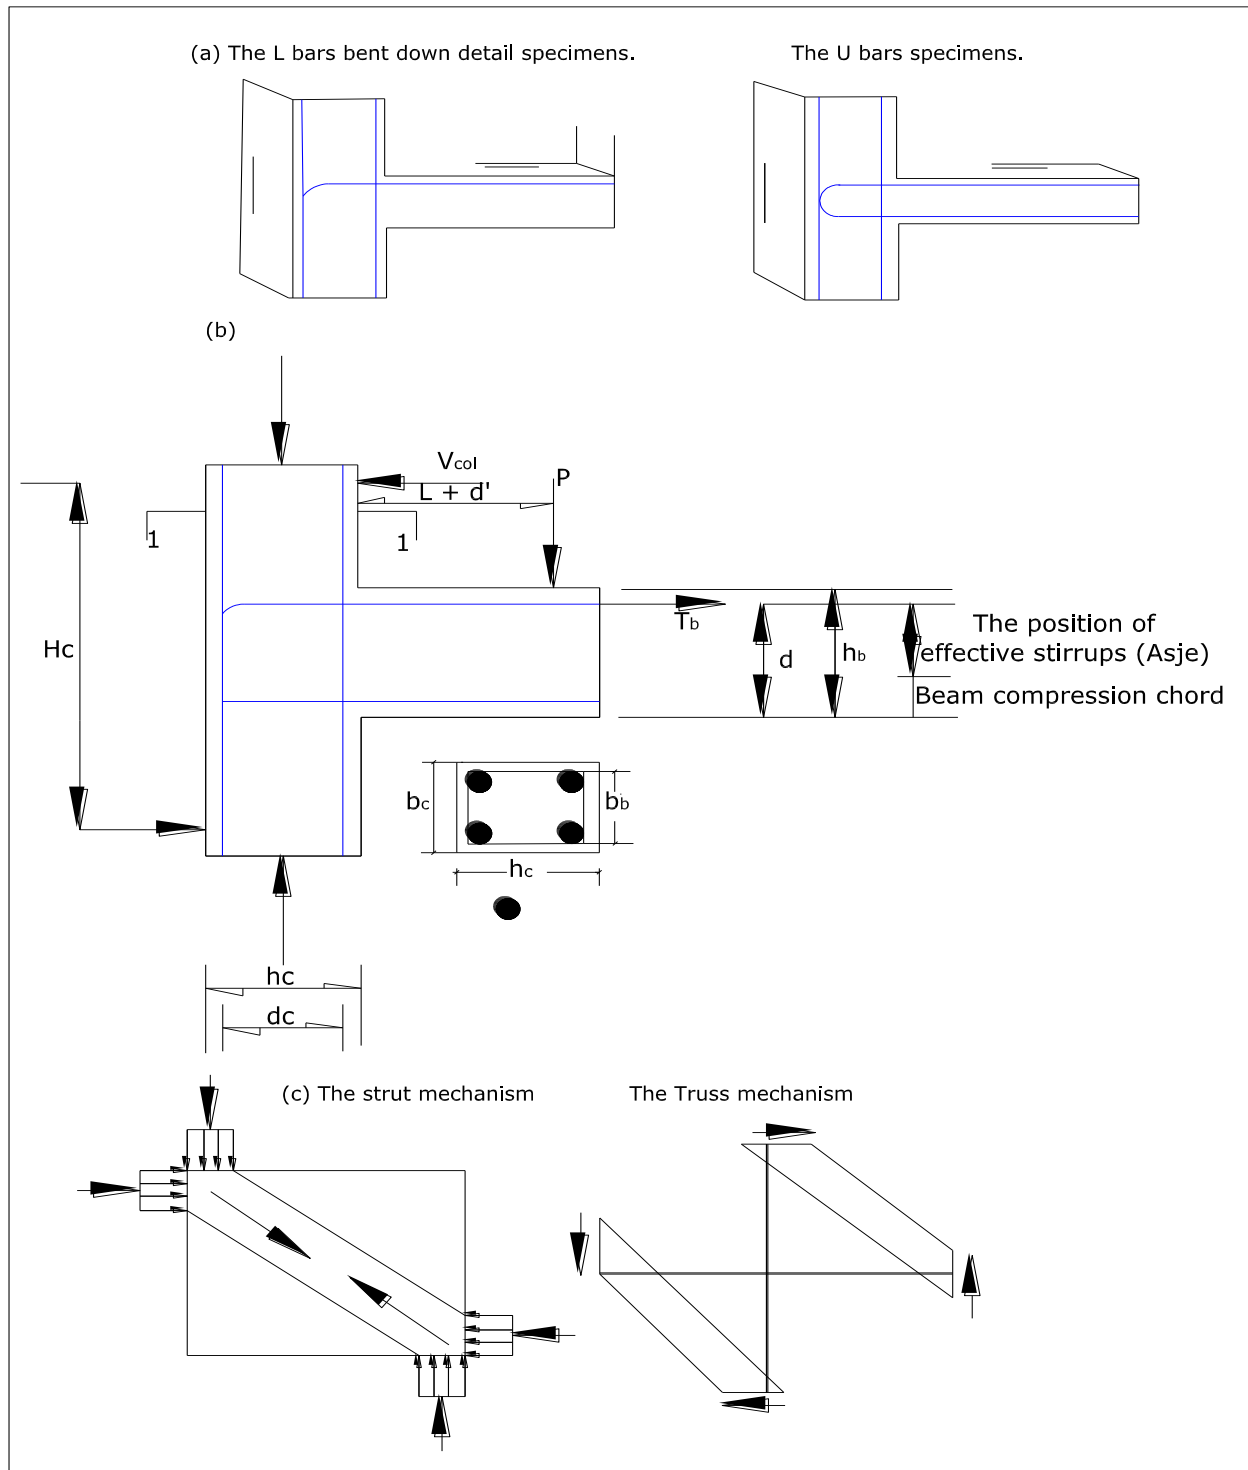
(a) Typical specimen shape in the experimental database; (b) Typical elevation and notations used for exterior beam column joints; (c) The strut and truss mechanisms
